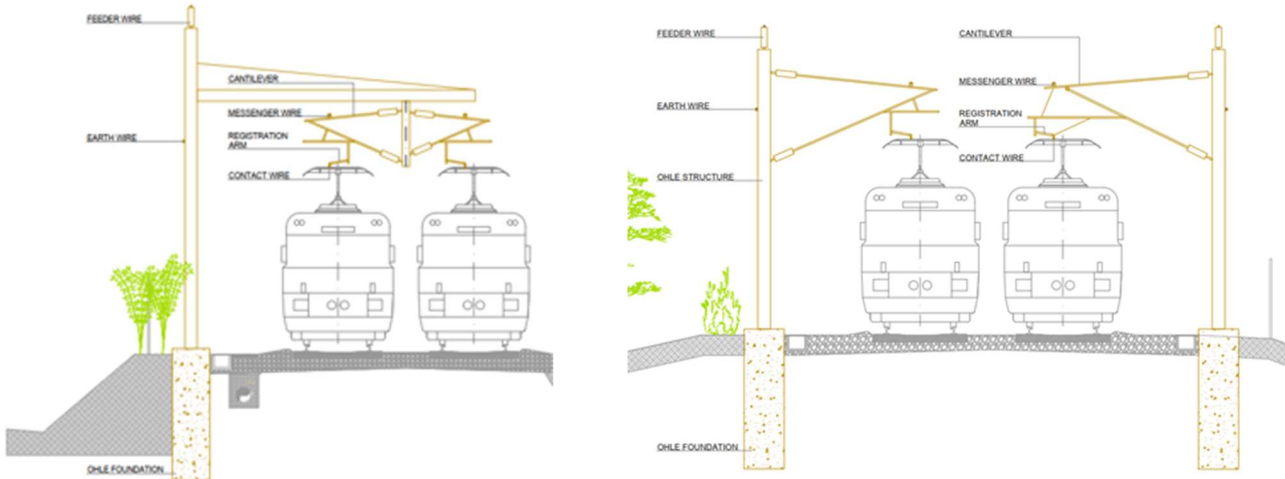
Alternative OHLE Arrangements in 2-Track Section
